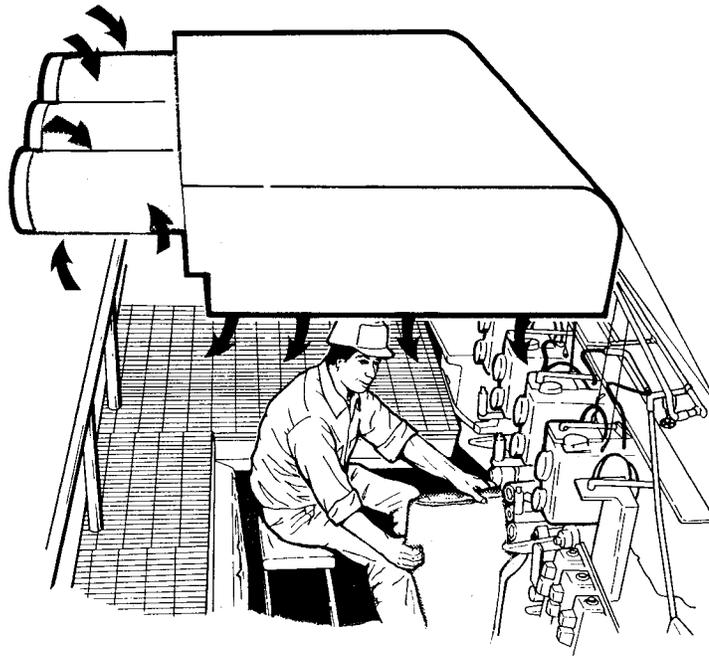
Installation Drawing of Self-Contained Air Curtain System With Standard Cylindrical Filter Elements
